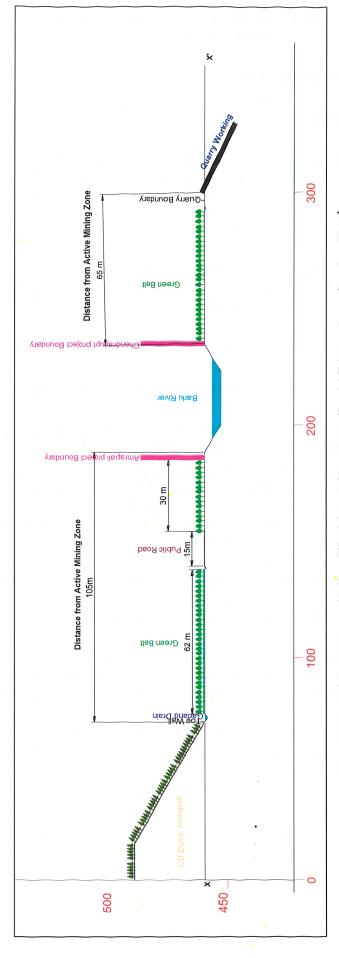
Plate VII: C/S Detailing of Mine Working Adjacent to Barki River along Section X-X1
